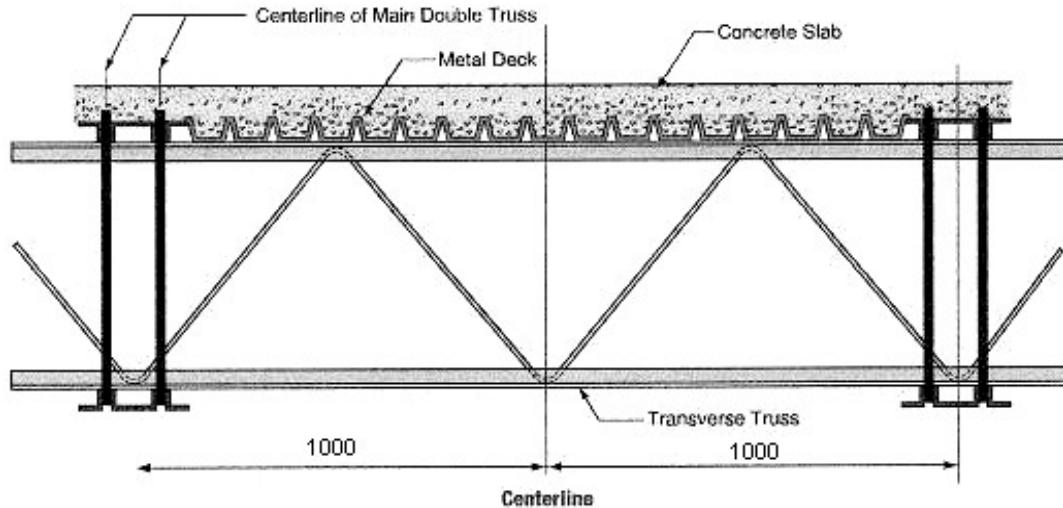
Cross-section through main double trusses, showing transverse truss (FEMA, 2002)
